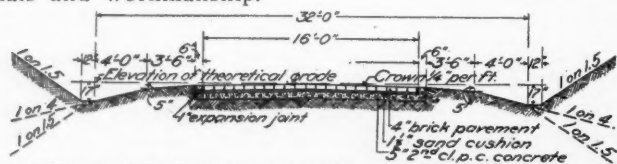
STANDARD SECTION, BRICK HIGHWAY.
